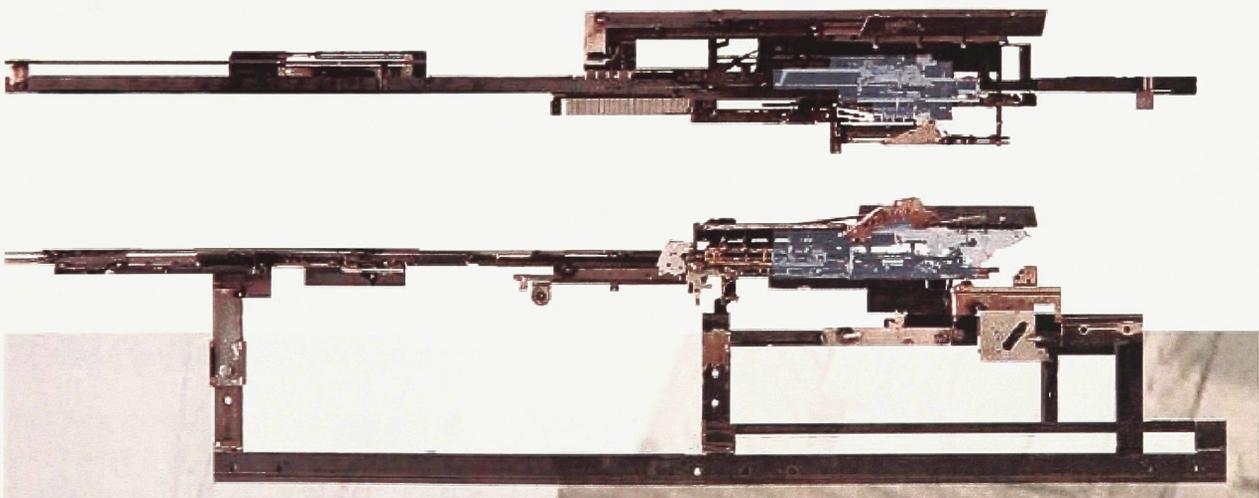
Airport Access MRT Terminal. Phase One. Plan (above) Elevation (below).
